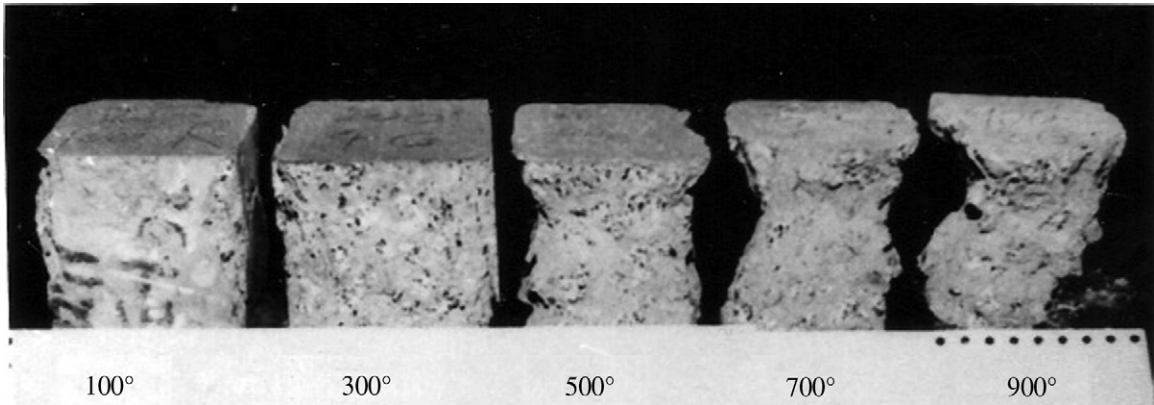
Failure patterns of compressive cubic specimens of concrete at elevated temperatures.
